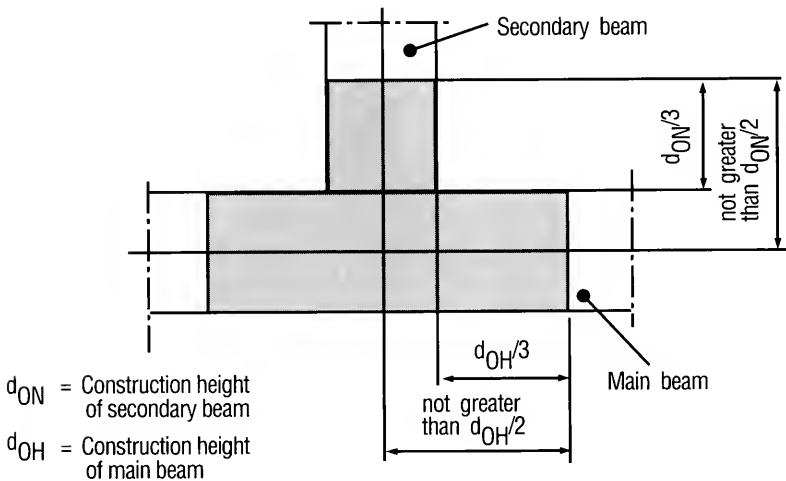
A. Extent of the intersection zone for the connection of secondary beams.\
